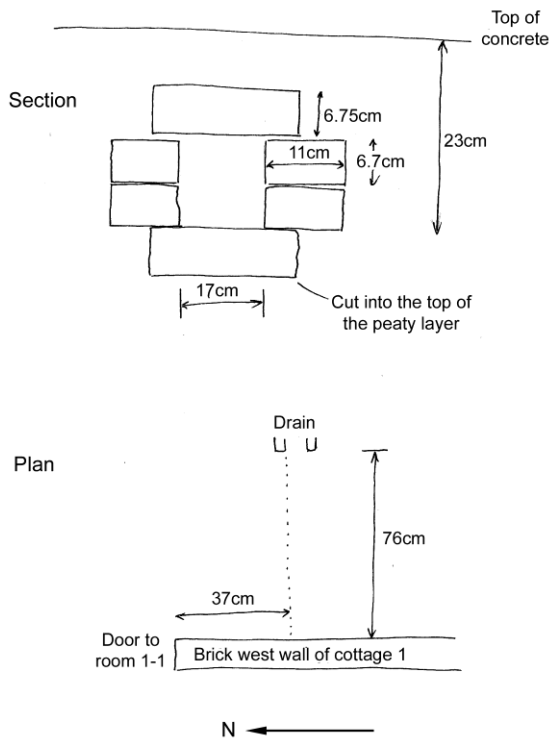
Sketch section and location plan of a drain found beneath cottage 1. Not to scale.
